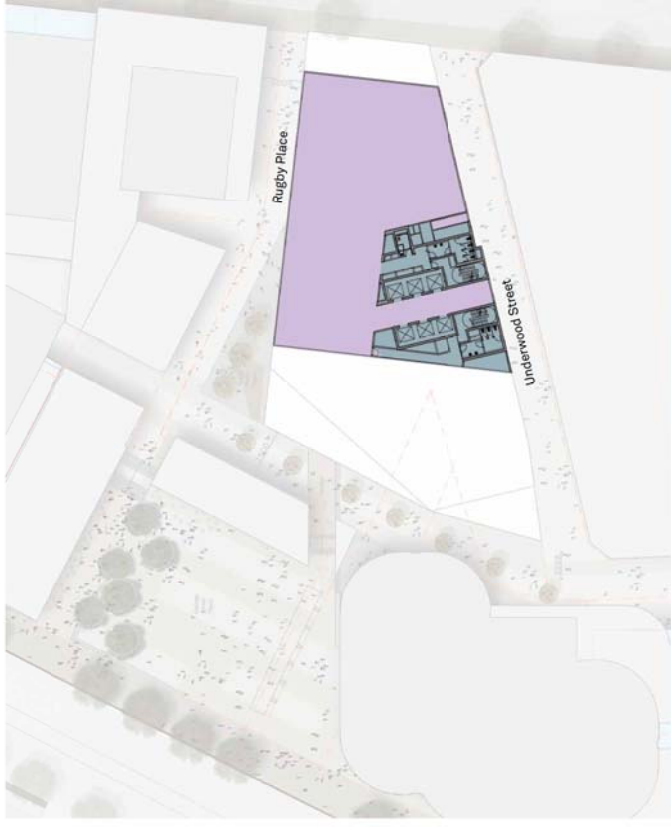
Reference design plan at typical upper high rise tower level (above RL 212)
